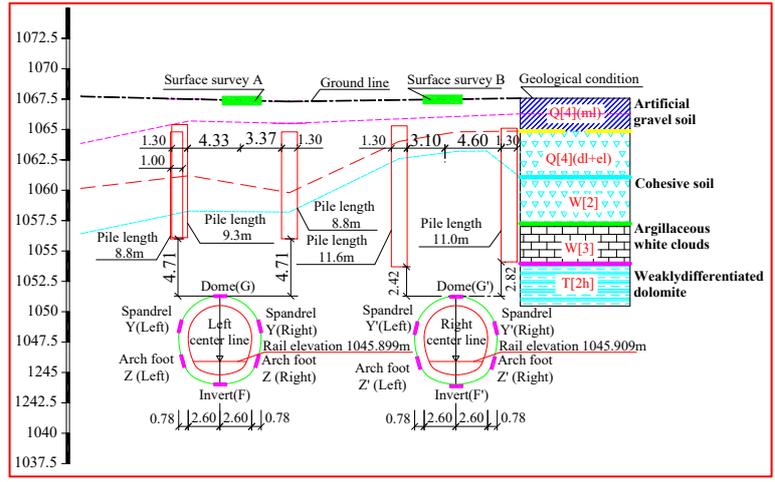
Schematic of pile foundation and layout test points (size unit: m)
